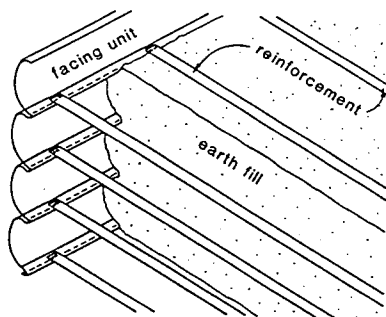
Vidal Reinforced Earth Structure with Metal Facing
